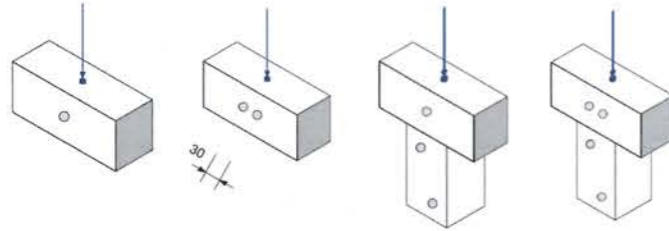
Design options for the force-transmitting attachment points, seen from left to right, with single screw, with twin screws, with single screws and support, and with twin screws and support
